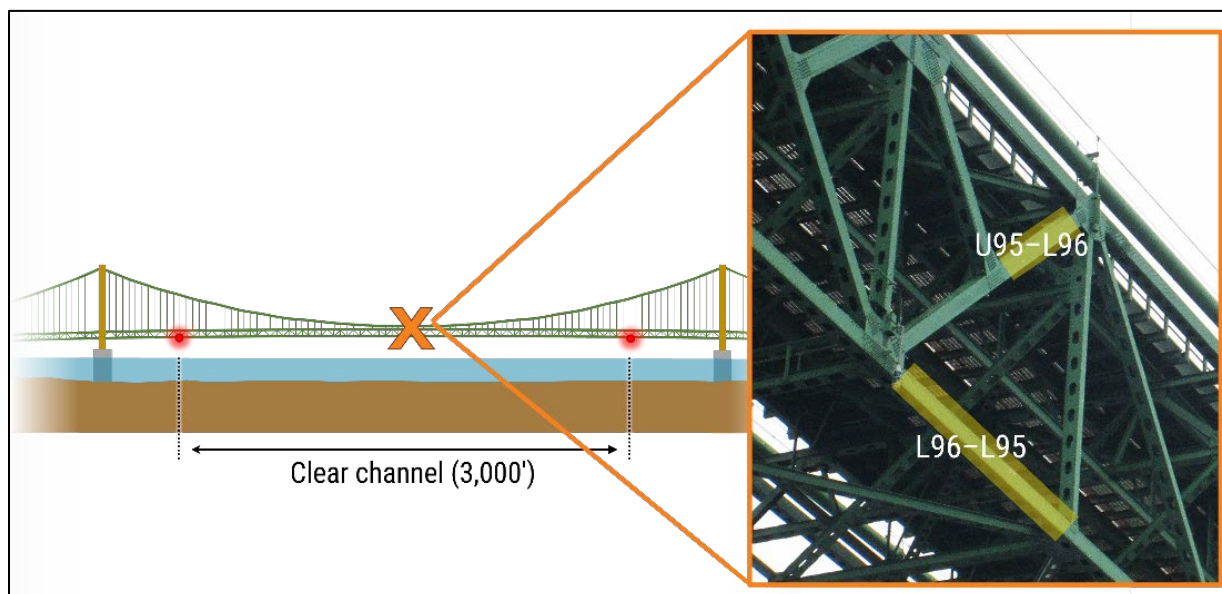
Area of west elevation of the Mackinac Bridge damaged by the contact with the crane boom aboard *BMI 209*, indicated by an X. Inset image at right indicates the location of the stiffening truss bottom chord (L96-L95) and upper diagonal truss (U95-L96). (Inset source: Mackinac Bridge Authority).
